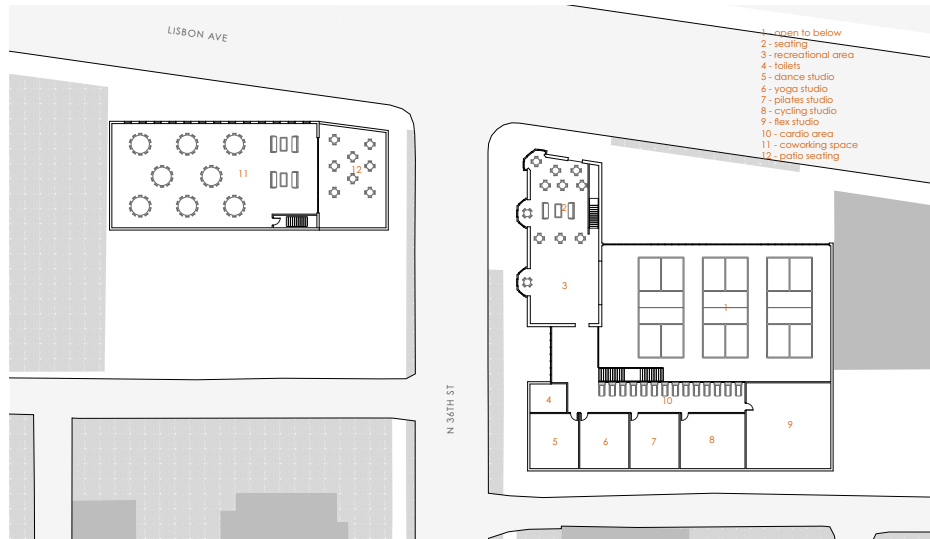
Second floor plan of the proposed use for the western building. Ground floor for the eastern building.
